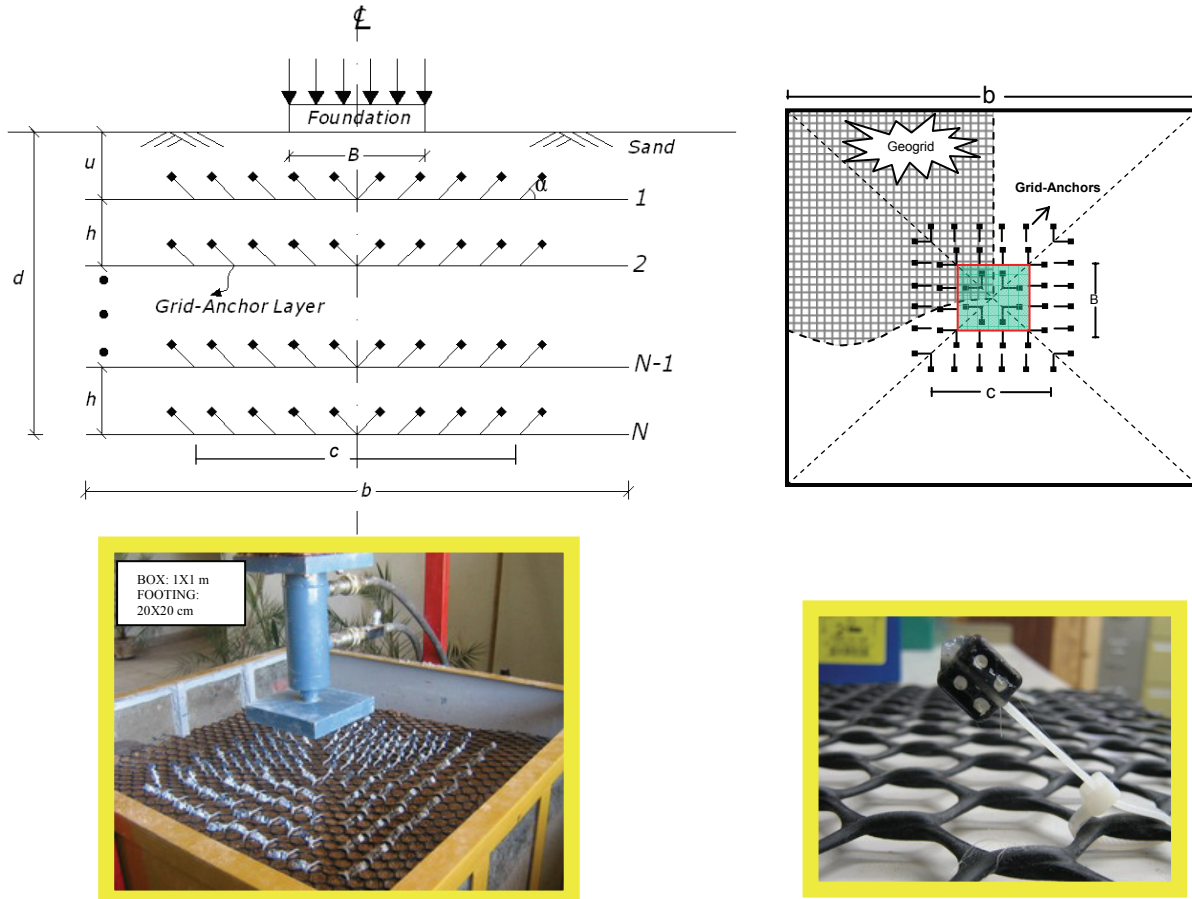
Schematic model and photos of the square foundation on Grid-Anchor reinforced soil
